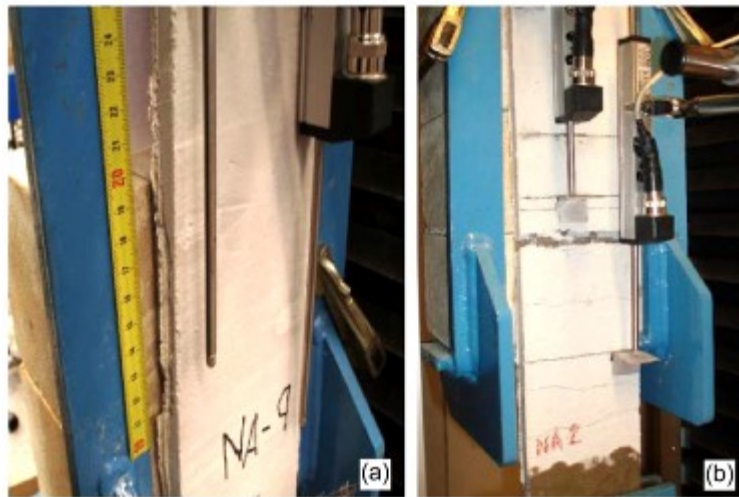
Failure modes in BTRM specimens: debonding at the substrate-matrix interface in specimens with anchorage length 85 mm (a) and slipping of the fibre rovings from the matrix in specimens with anchorage length 220 mm (b)
